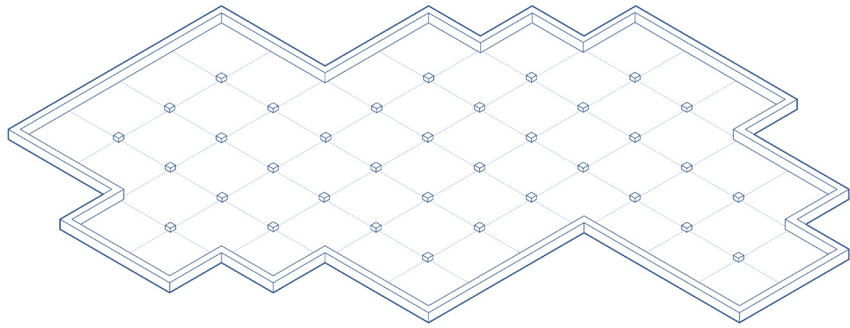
Foundation of the Deck: Foundation Wall and Piles
